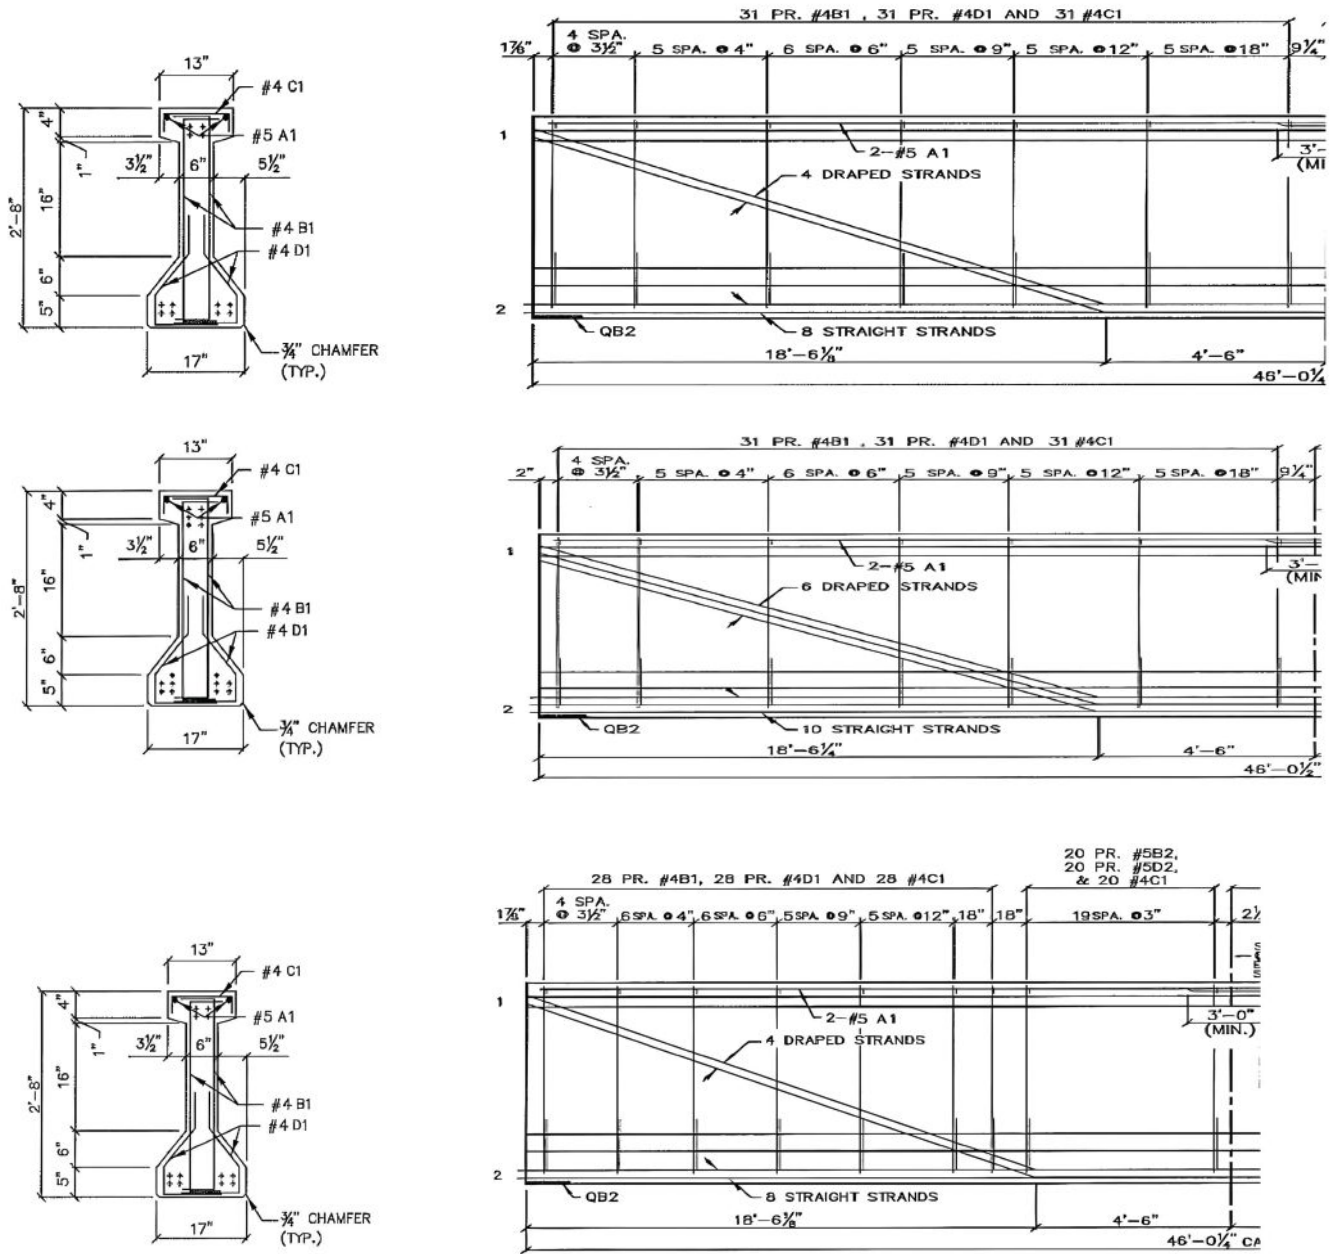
Test specimens' reinforcement details: 12 strands (top), 16 strands (center), and 12 strands with additional stirrups (bottom). All Photos and Figures: Missouri University of Science and Technology.
